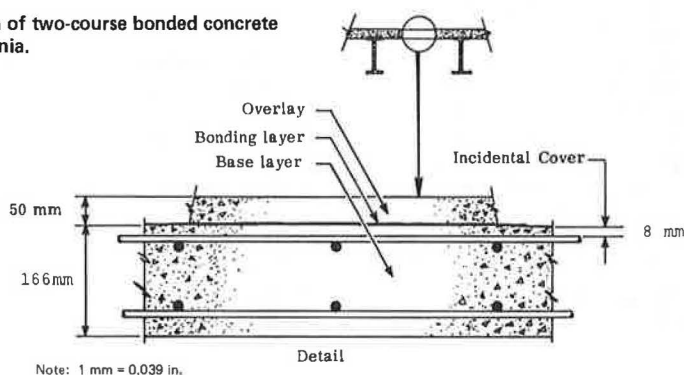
Typical transverse section of two-course bonded concrete bridge decks as constructed in Virginia.
